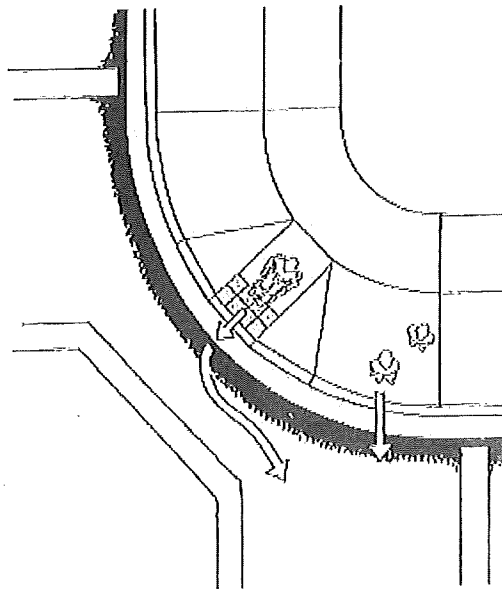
When a single diagonal curb ramp is provided, wheelchair users cross in a different location than other pedestrians.
